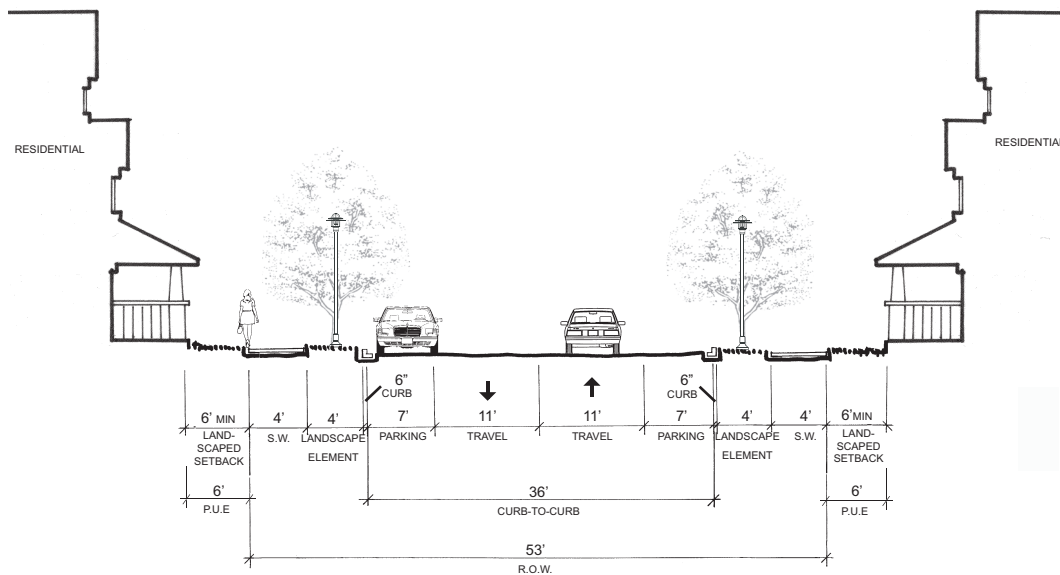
D.38: Mariner's Cove Residential Street Cross Section (Typical) ①
